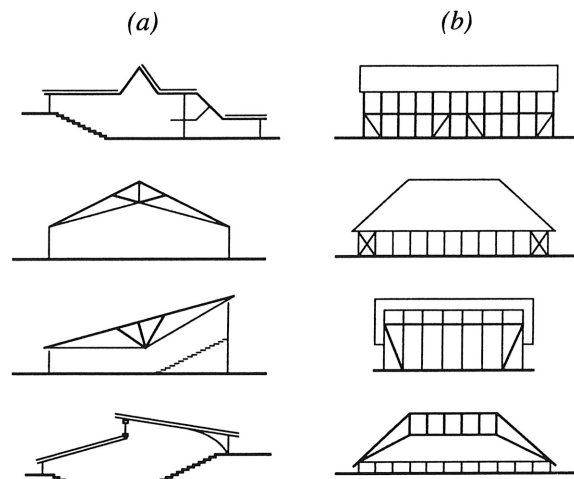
Some complex structural forms. (a) section, (b) elevation.
